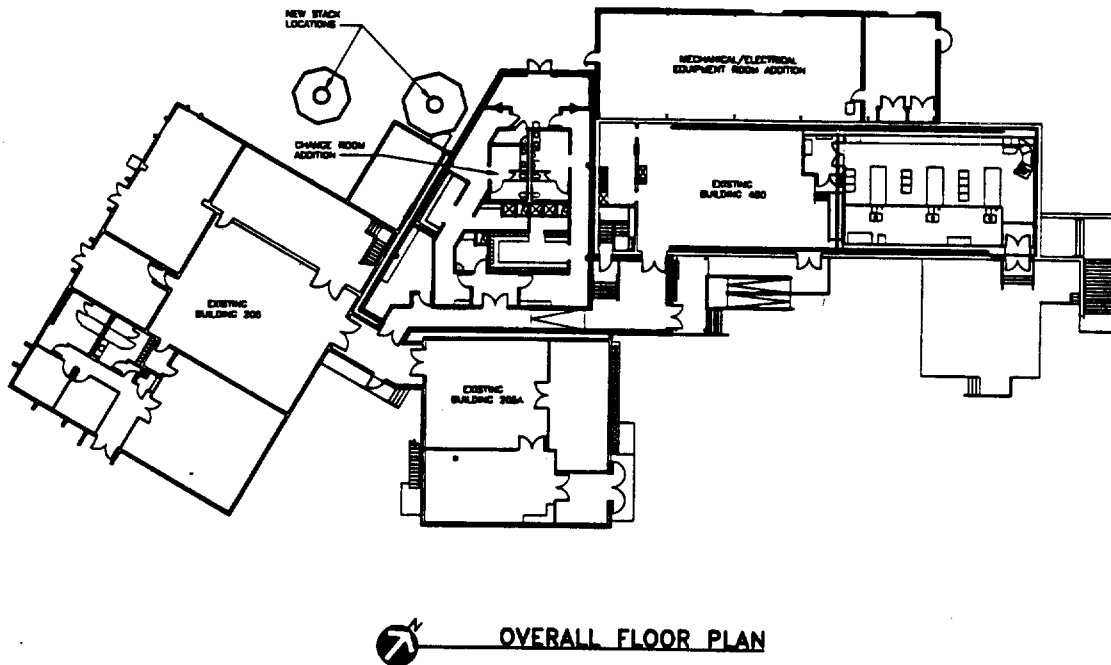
Overall floor plan for expanded tritium facility at Los Alamos National Laboratory.
